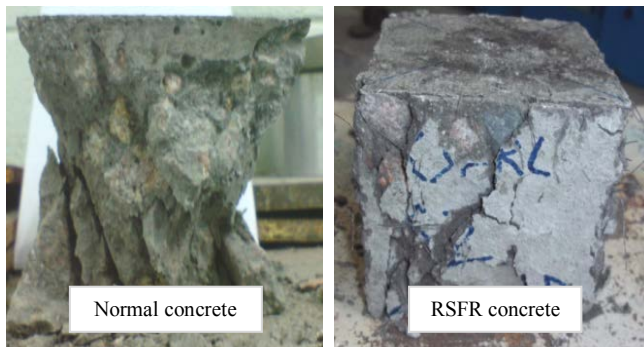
Typical failure mode of normal and recycled steel fibre reinforced (RSFR) concrete cube.
